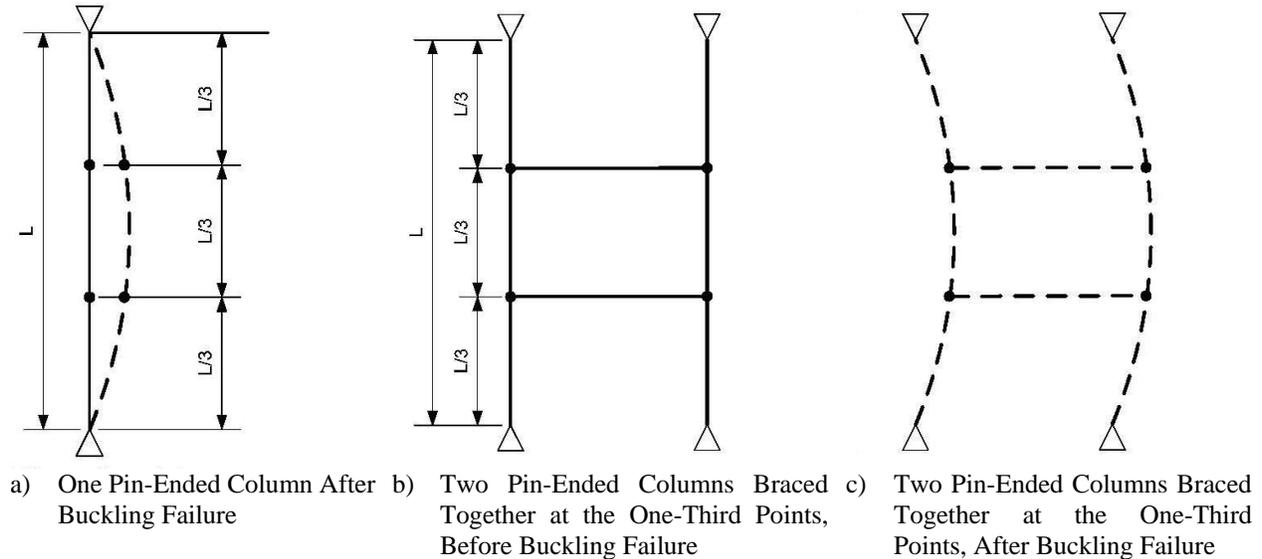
Pin-Ended Column Example Showing Overall Buckling of a) Single Pin-Ended Column; b) Two Pin-Ended Columns with c) Ineffective Bracings
